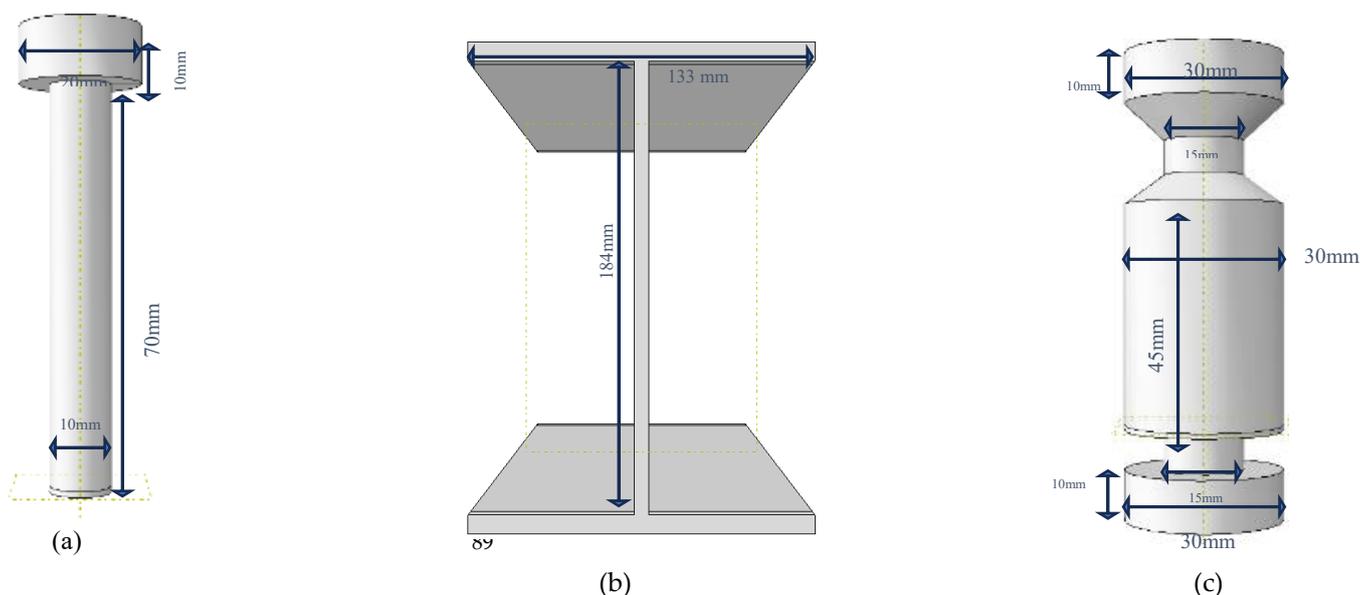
(a) Head studs, (b) girder, & (c) removable bolts dimensions
